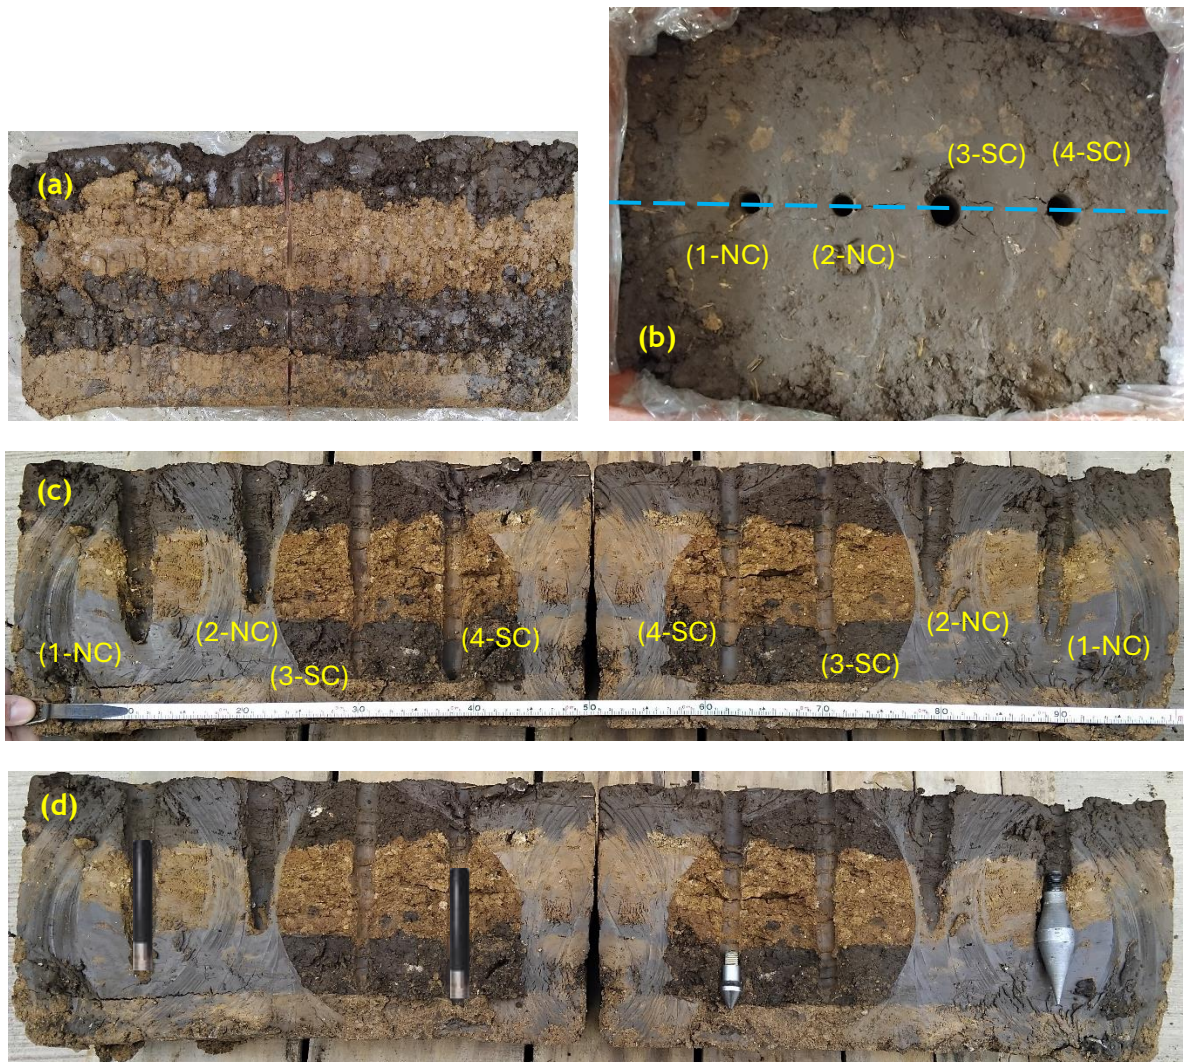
a) Side view of the large compacted sample built after removal from the mould, b) top view of the large compacted sample after performing the four DCP tests, c) large compacted sample wire-cut down the axis of the tests with the holes of the tests shown, and d) the same section with the two different cones used placed on the right part of the cut sample and the TEROS 22 sensors on the left part of the cut sample.
